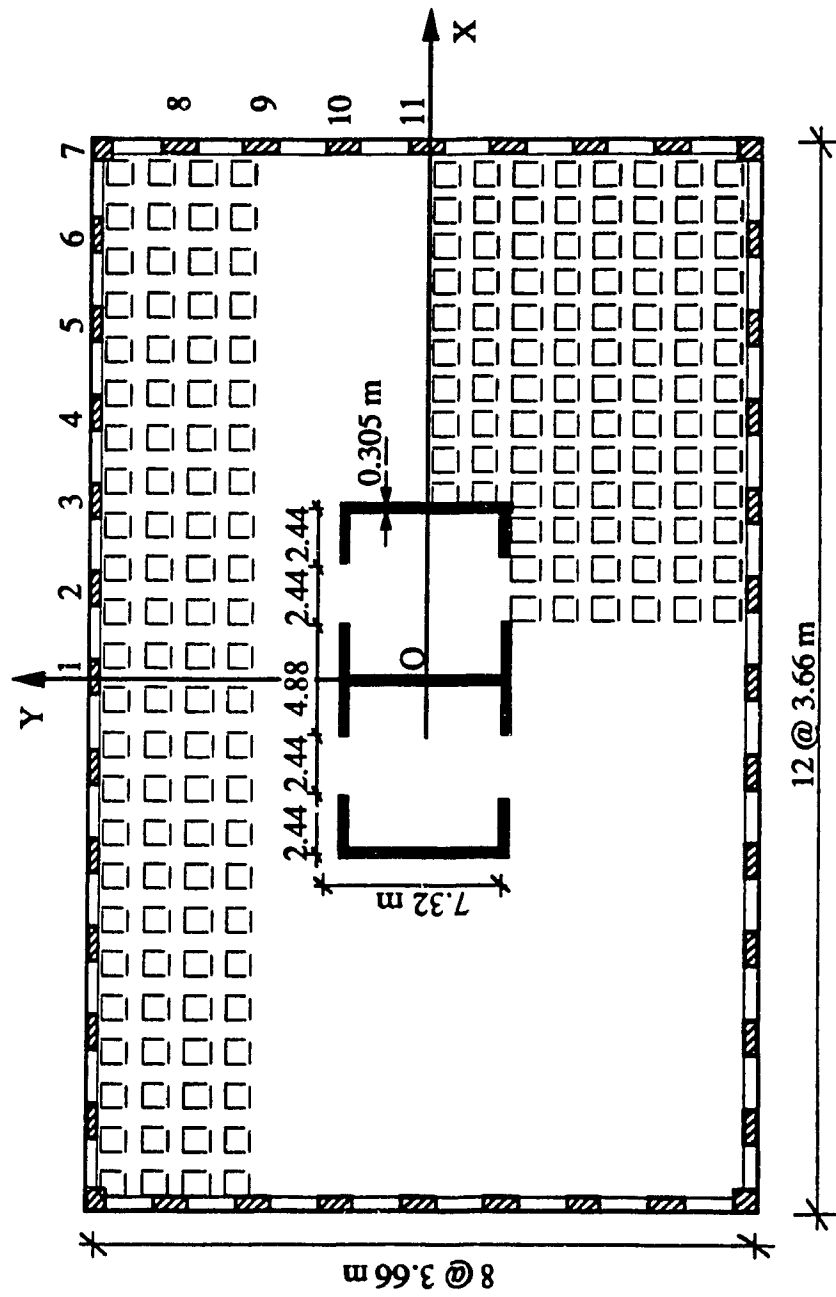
Plan of 30-story tube-in-tube with waffle floor slabs
